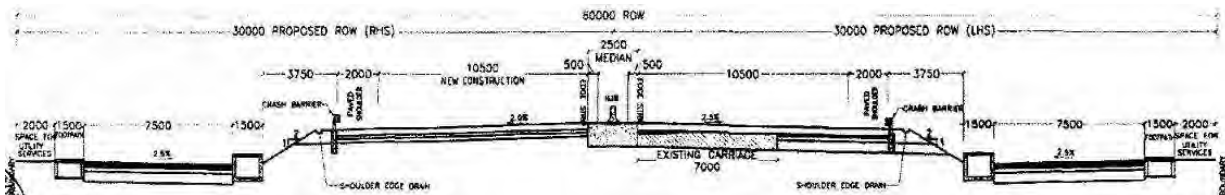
Typical Cross Section for left widening with both side service road (TCS-13)
